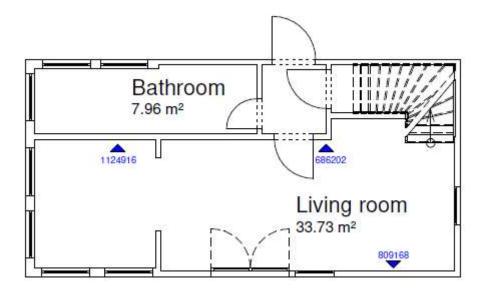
Plan of the ground floor of KLG Eschenkogel showing the data logger locations
